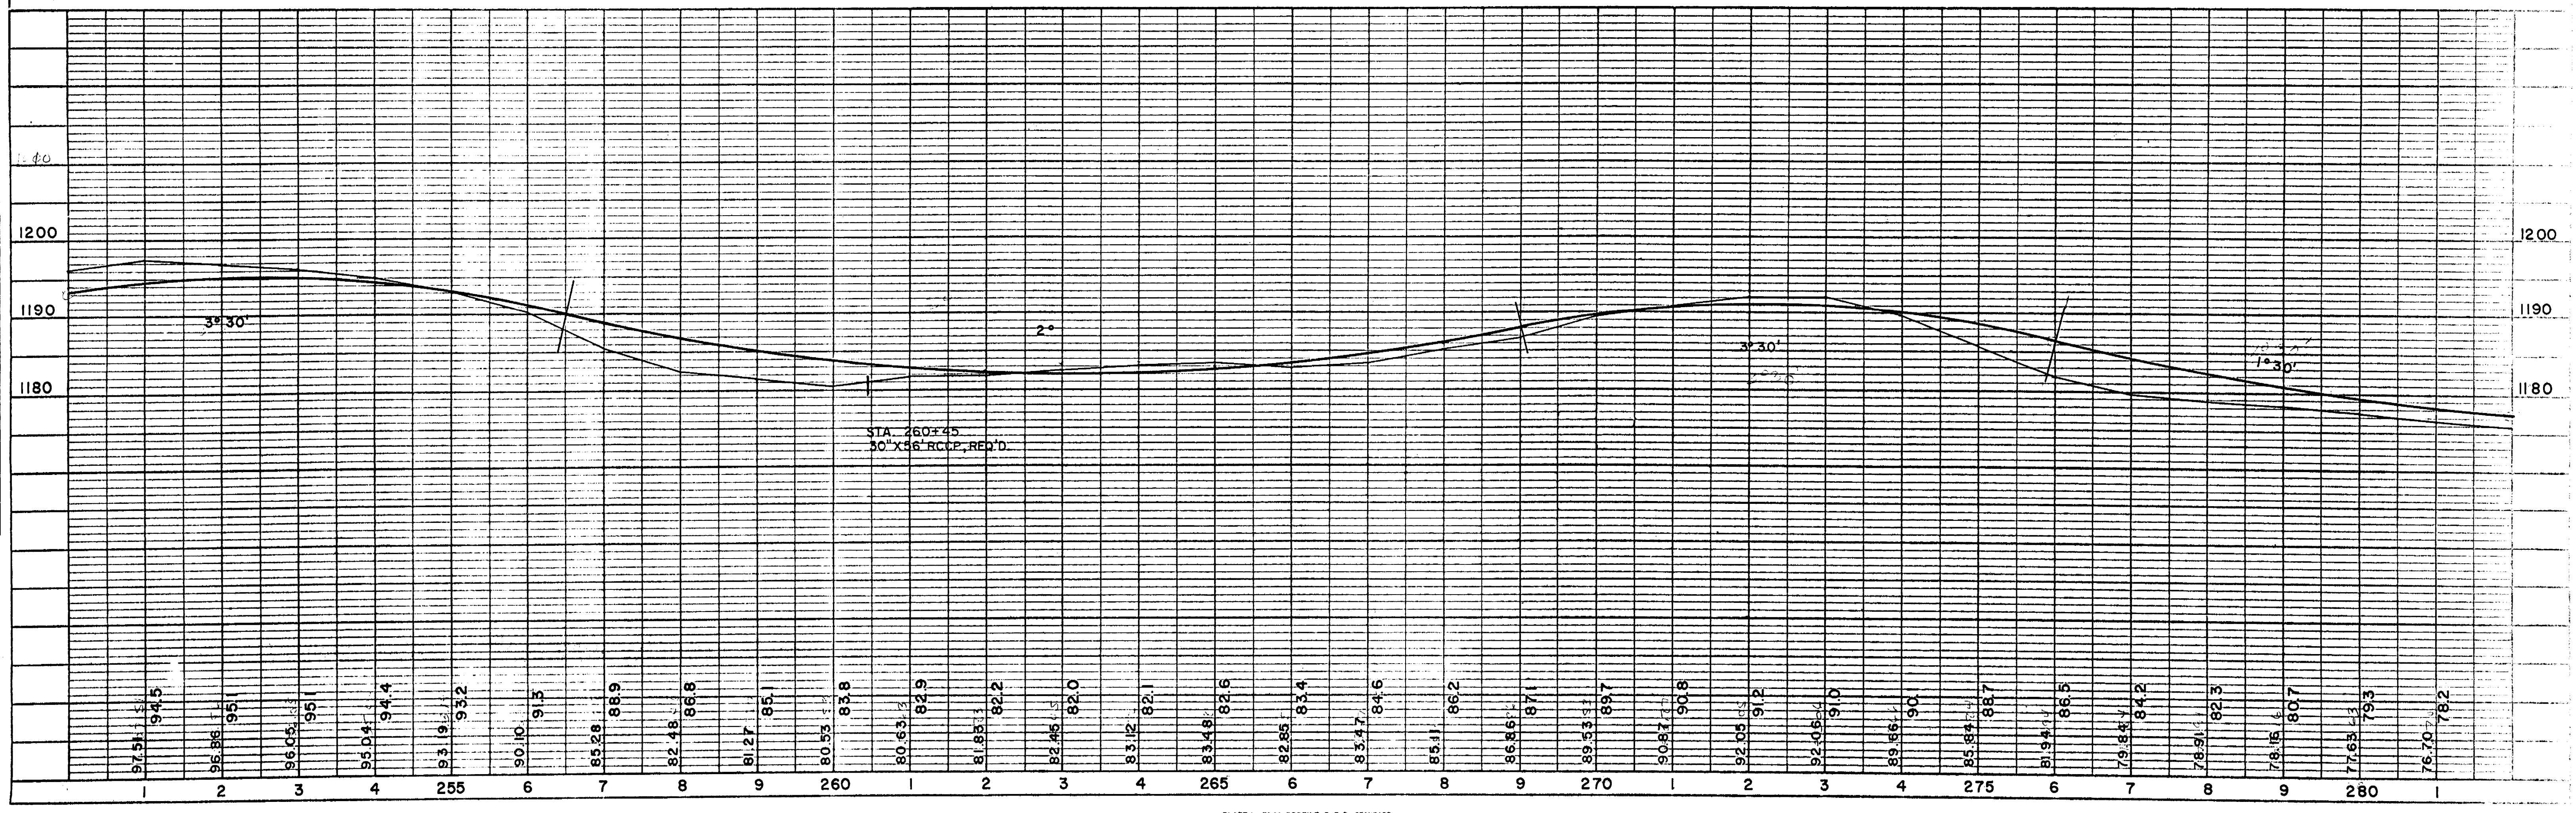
PLAN PROFILE B. P. R. STANDARD
